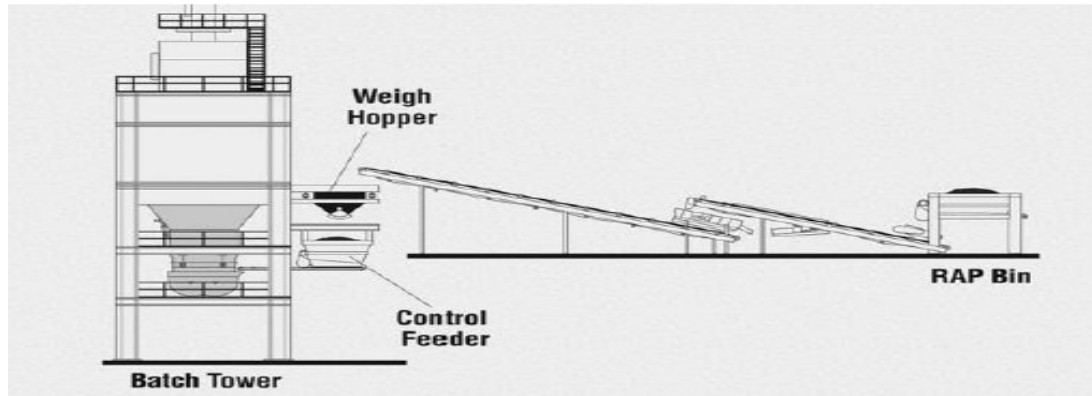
Reclaimed asphalt pavement delivery system for batch plants (Santucci, 2007).
